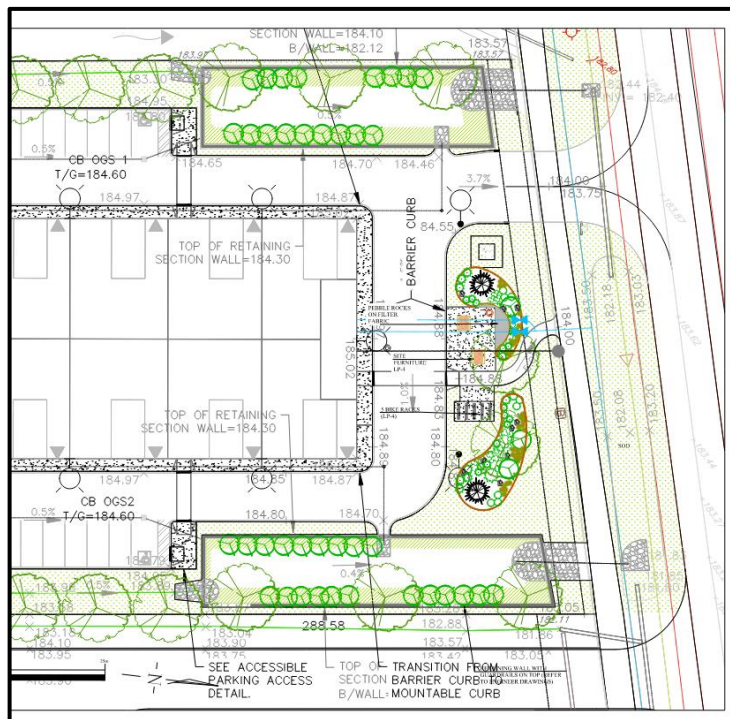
Landscape Key Plan excerpt showing interface with Mountain Road
